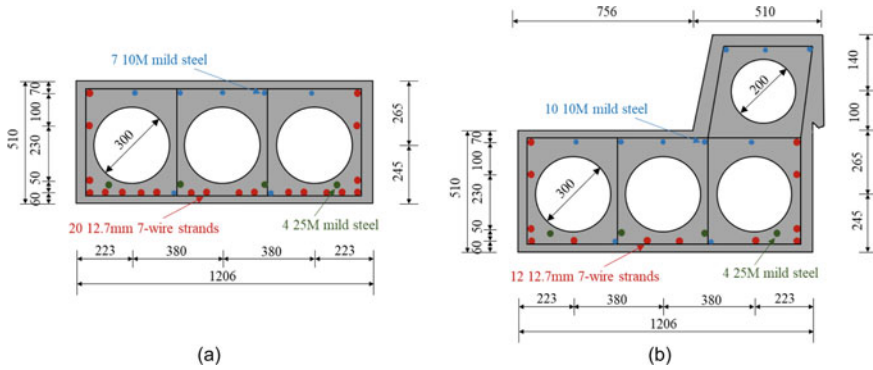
Cross sections of a Interior girders, and b Exterior girders (dimension in mm)
